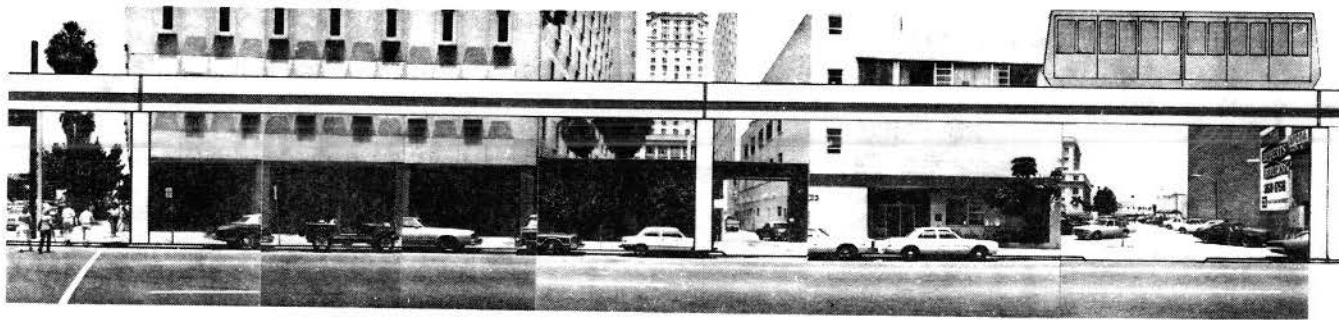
FEDERAL BUILDING S.W. 1st ST. & S.W. 1st AVE. LOOKING NORTH
